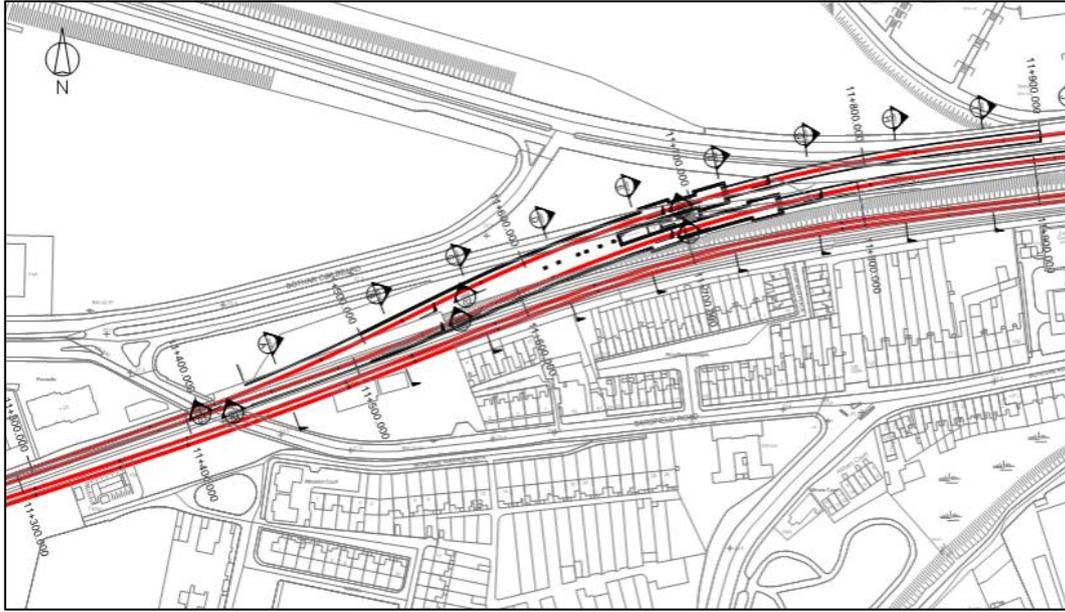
Plan layout of Western Portal as proposed in Western Tie-In Report
